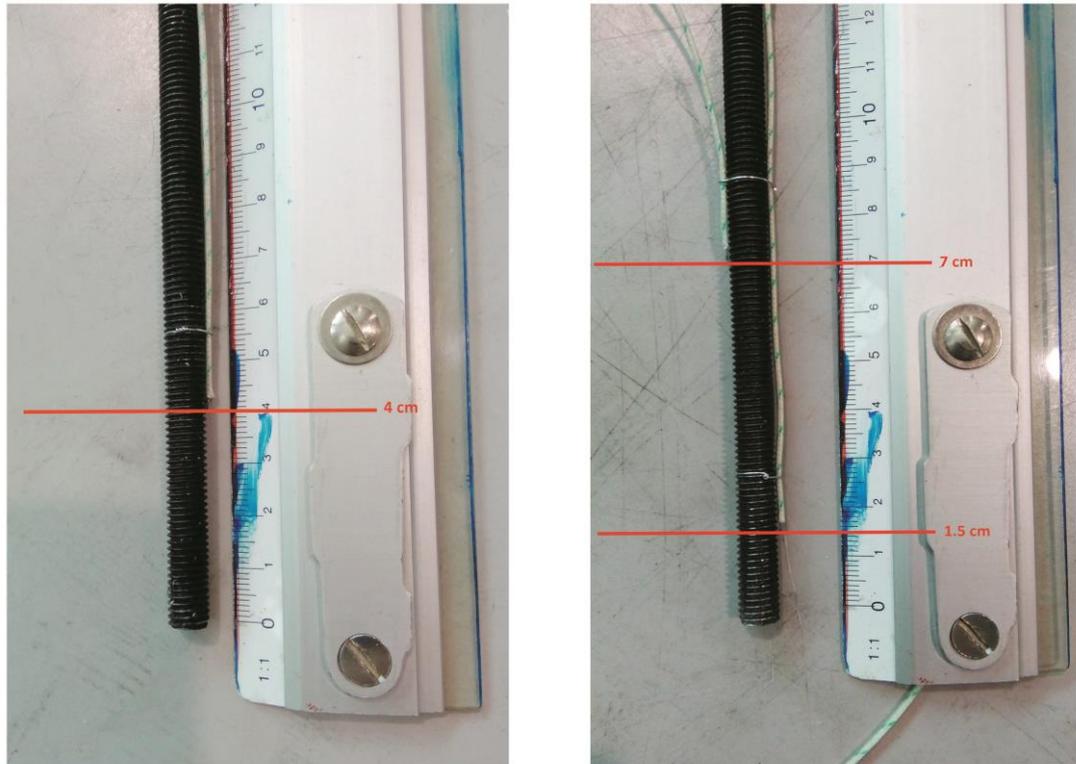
thermocouples installation for samples with a threaded hole shape (left) and for samples with a cylindrical bore hole (right)
